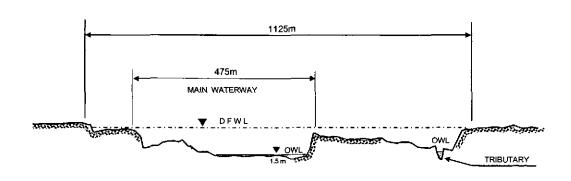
PAMPANGA RIVER SECTION AT PROPOSED SITE LOCATION
